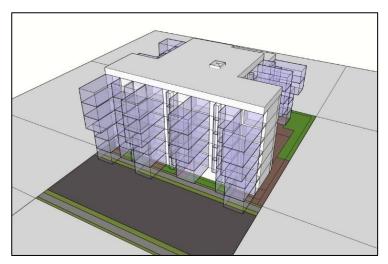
Modelling of 8m principal living room depth standard. Modelling shows modelled development informed by the proposed standards with principal living room areas drawn to the street or set back from site boundaries towards the rear.
